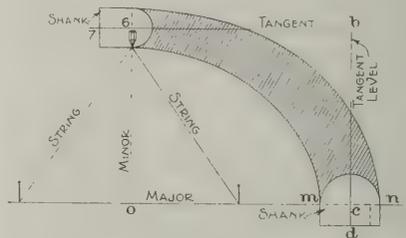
Laying Out Face Mold for Wreath Over Fig. 1
